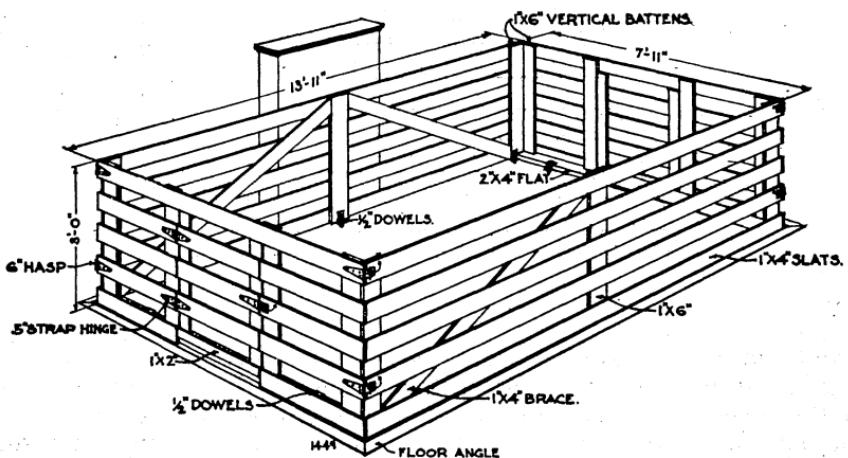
Detailed plan for construction of portable scale rack. (Design No. 1449)
